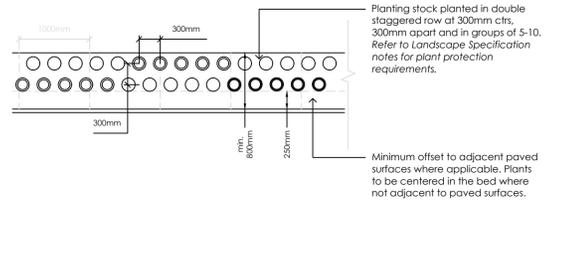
Typical Shrub Planting Layout (N.T.S.)
